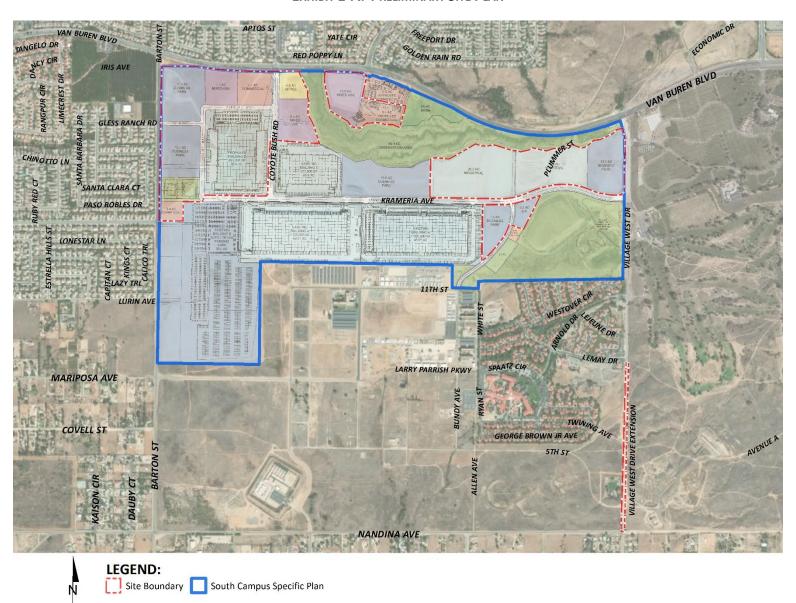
A: PRELIMINARY SITE PLAN
